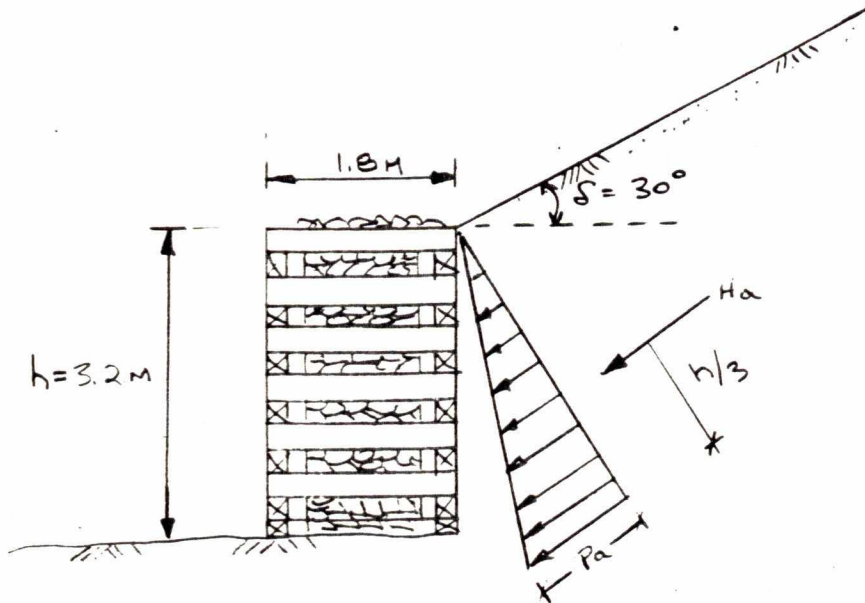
TIMBER CRIB WALL AT LONG HARBOUR
